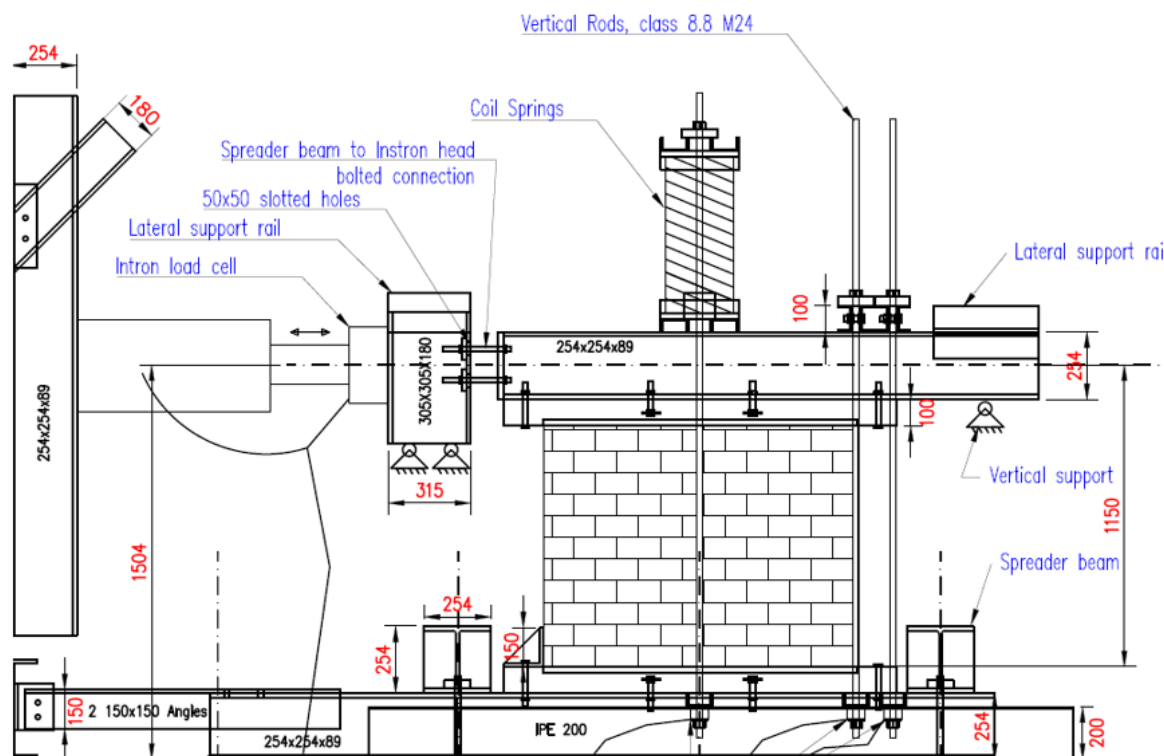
Experimental masonry shear wall setup (De Beer, 2016).
